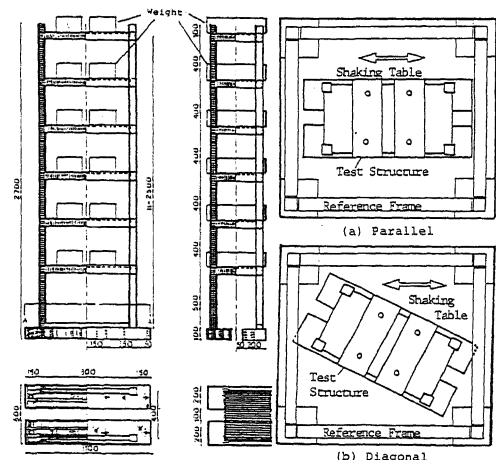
Details of Test Structure Fig.2 Setting Plan of Test Structure
